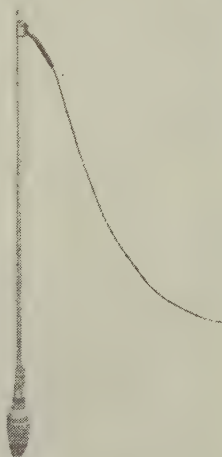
A PUDDLER USED ON MASS CONCRETE IN 1923
